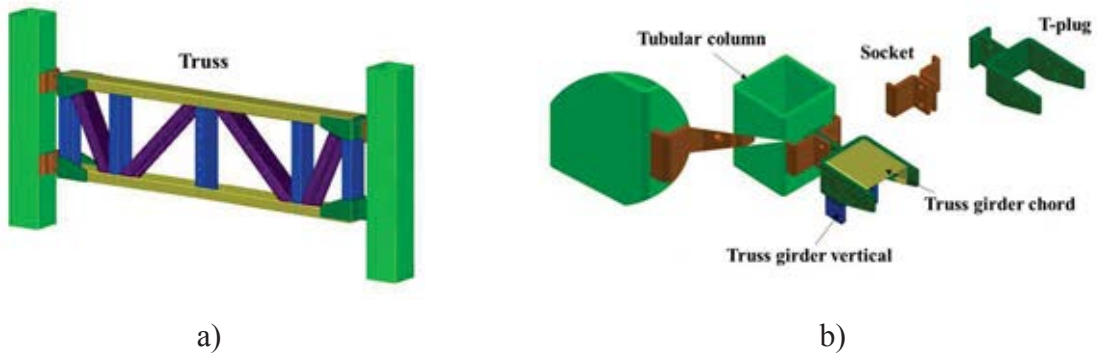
Structural system (a); Details of the plug-and-play connection (b)
